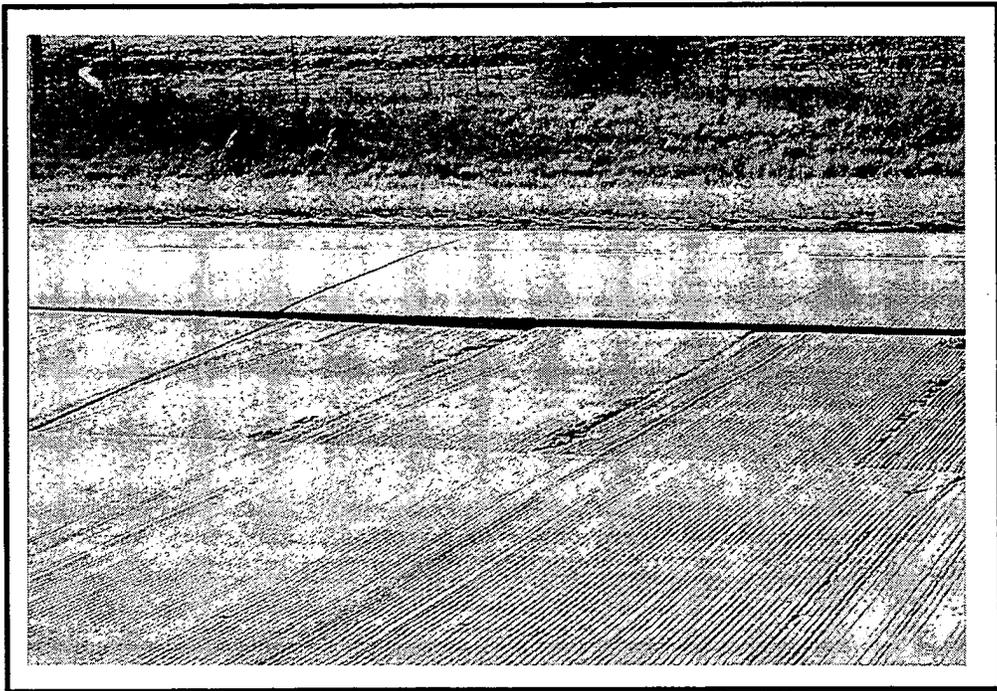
Settlements in Jointed Concrete Pavement, Medium Severity
